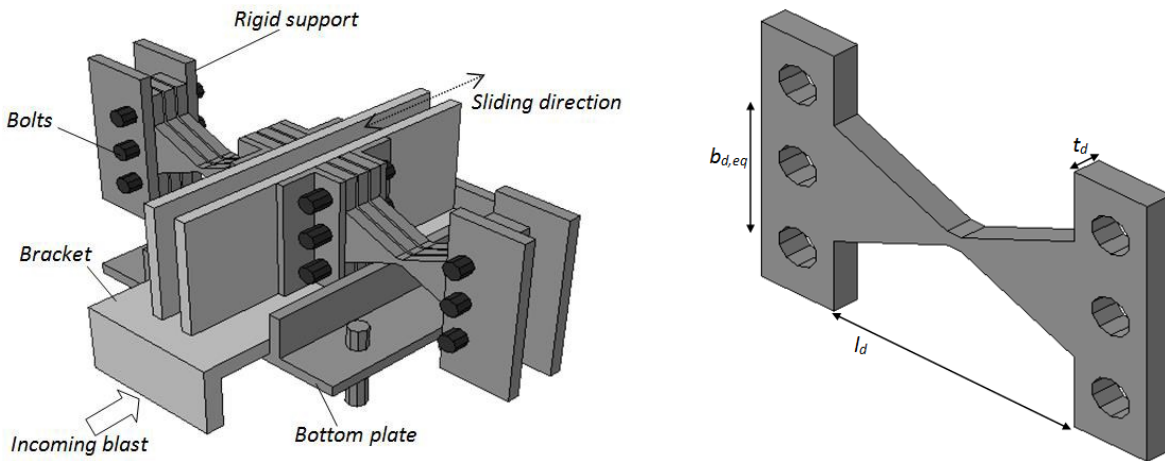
27 : ADAS device assembly (left) and X shaped steel components (right)
